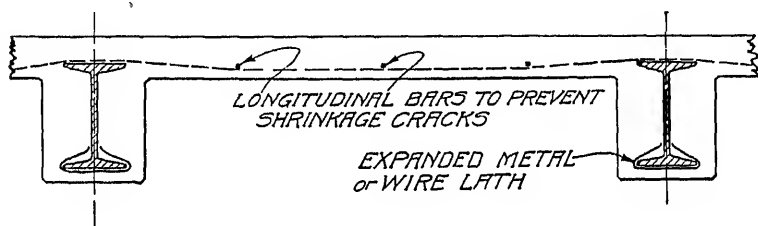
Diagram Showing Method of Placing Concrete Floor Slabs on I-Beam Girders
